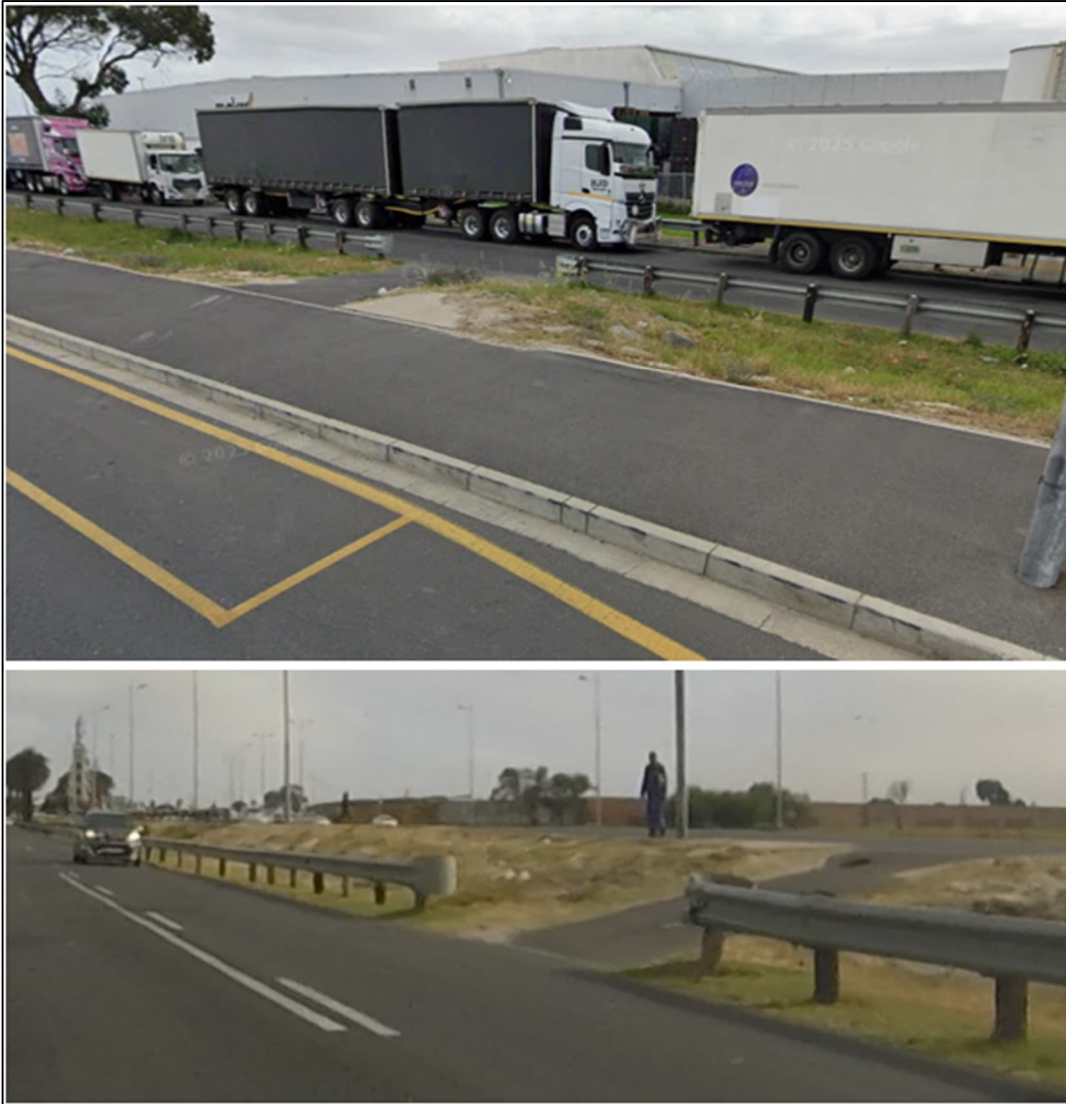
Gap in Guardrail along Eastern Edge of Strandfontein Road (service road)
